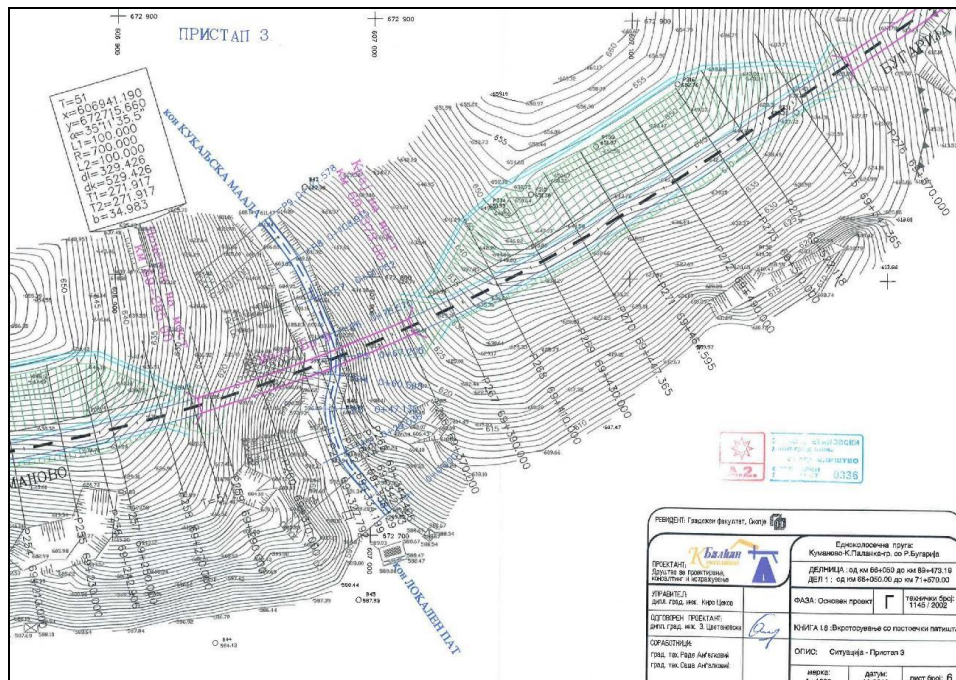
Example of crossing with dirty road. Bridge 09 included in previous Preliminary Design
